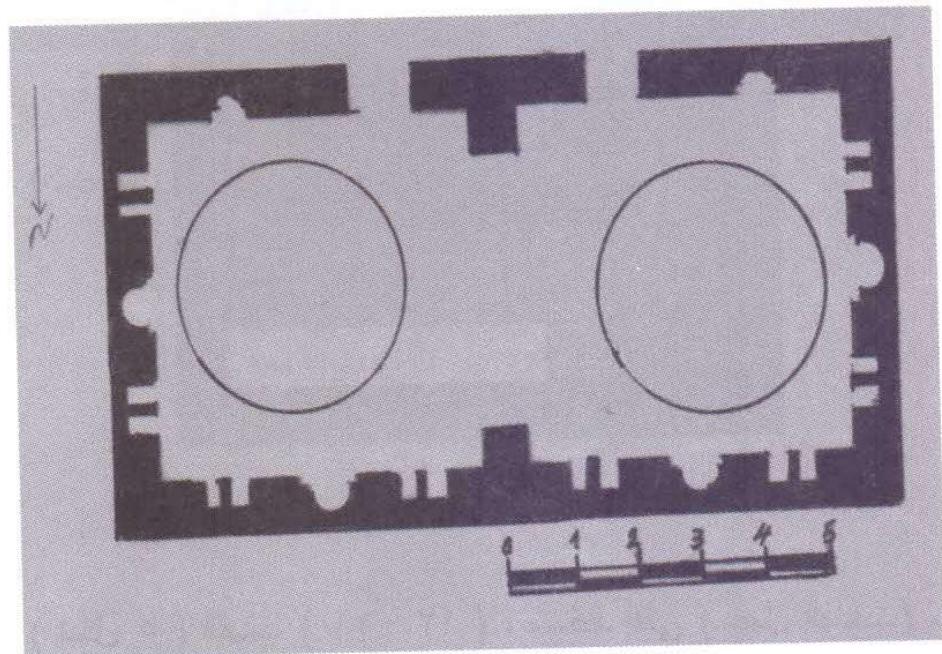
(Funerary Chapel (شال)) - (Horizontal Section (مسقط افقي)) - (Work of the Researcher (عمل الباحث))
